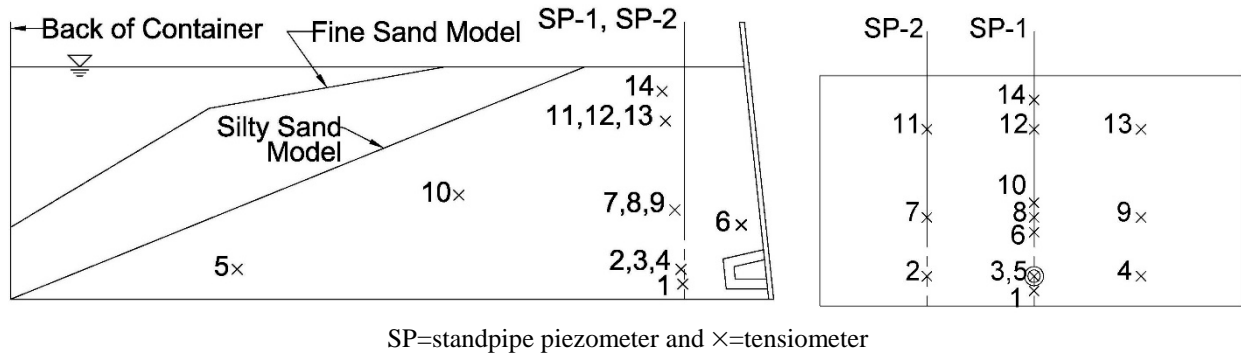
Instrumentation locations: cross section view (left) and front view (right) of retaining wall
